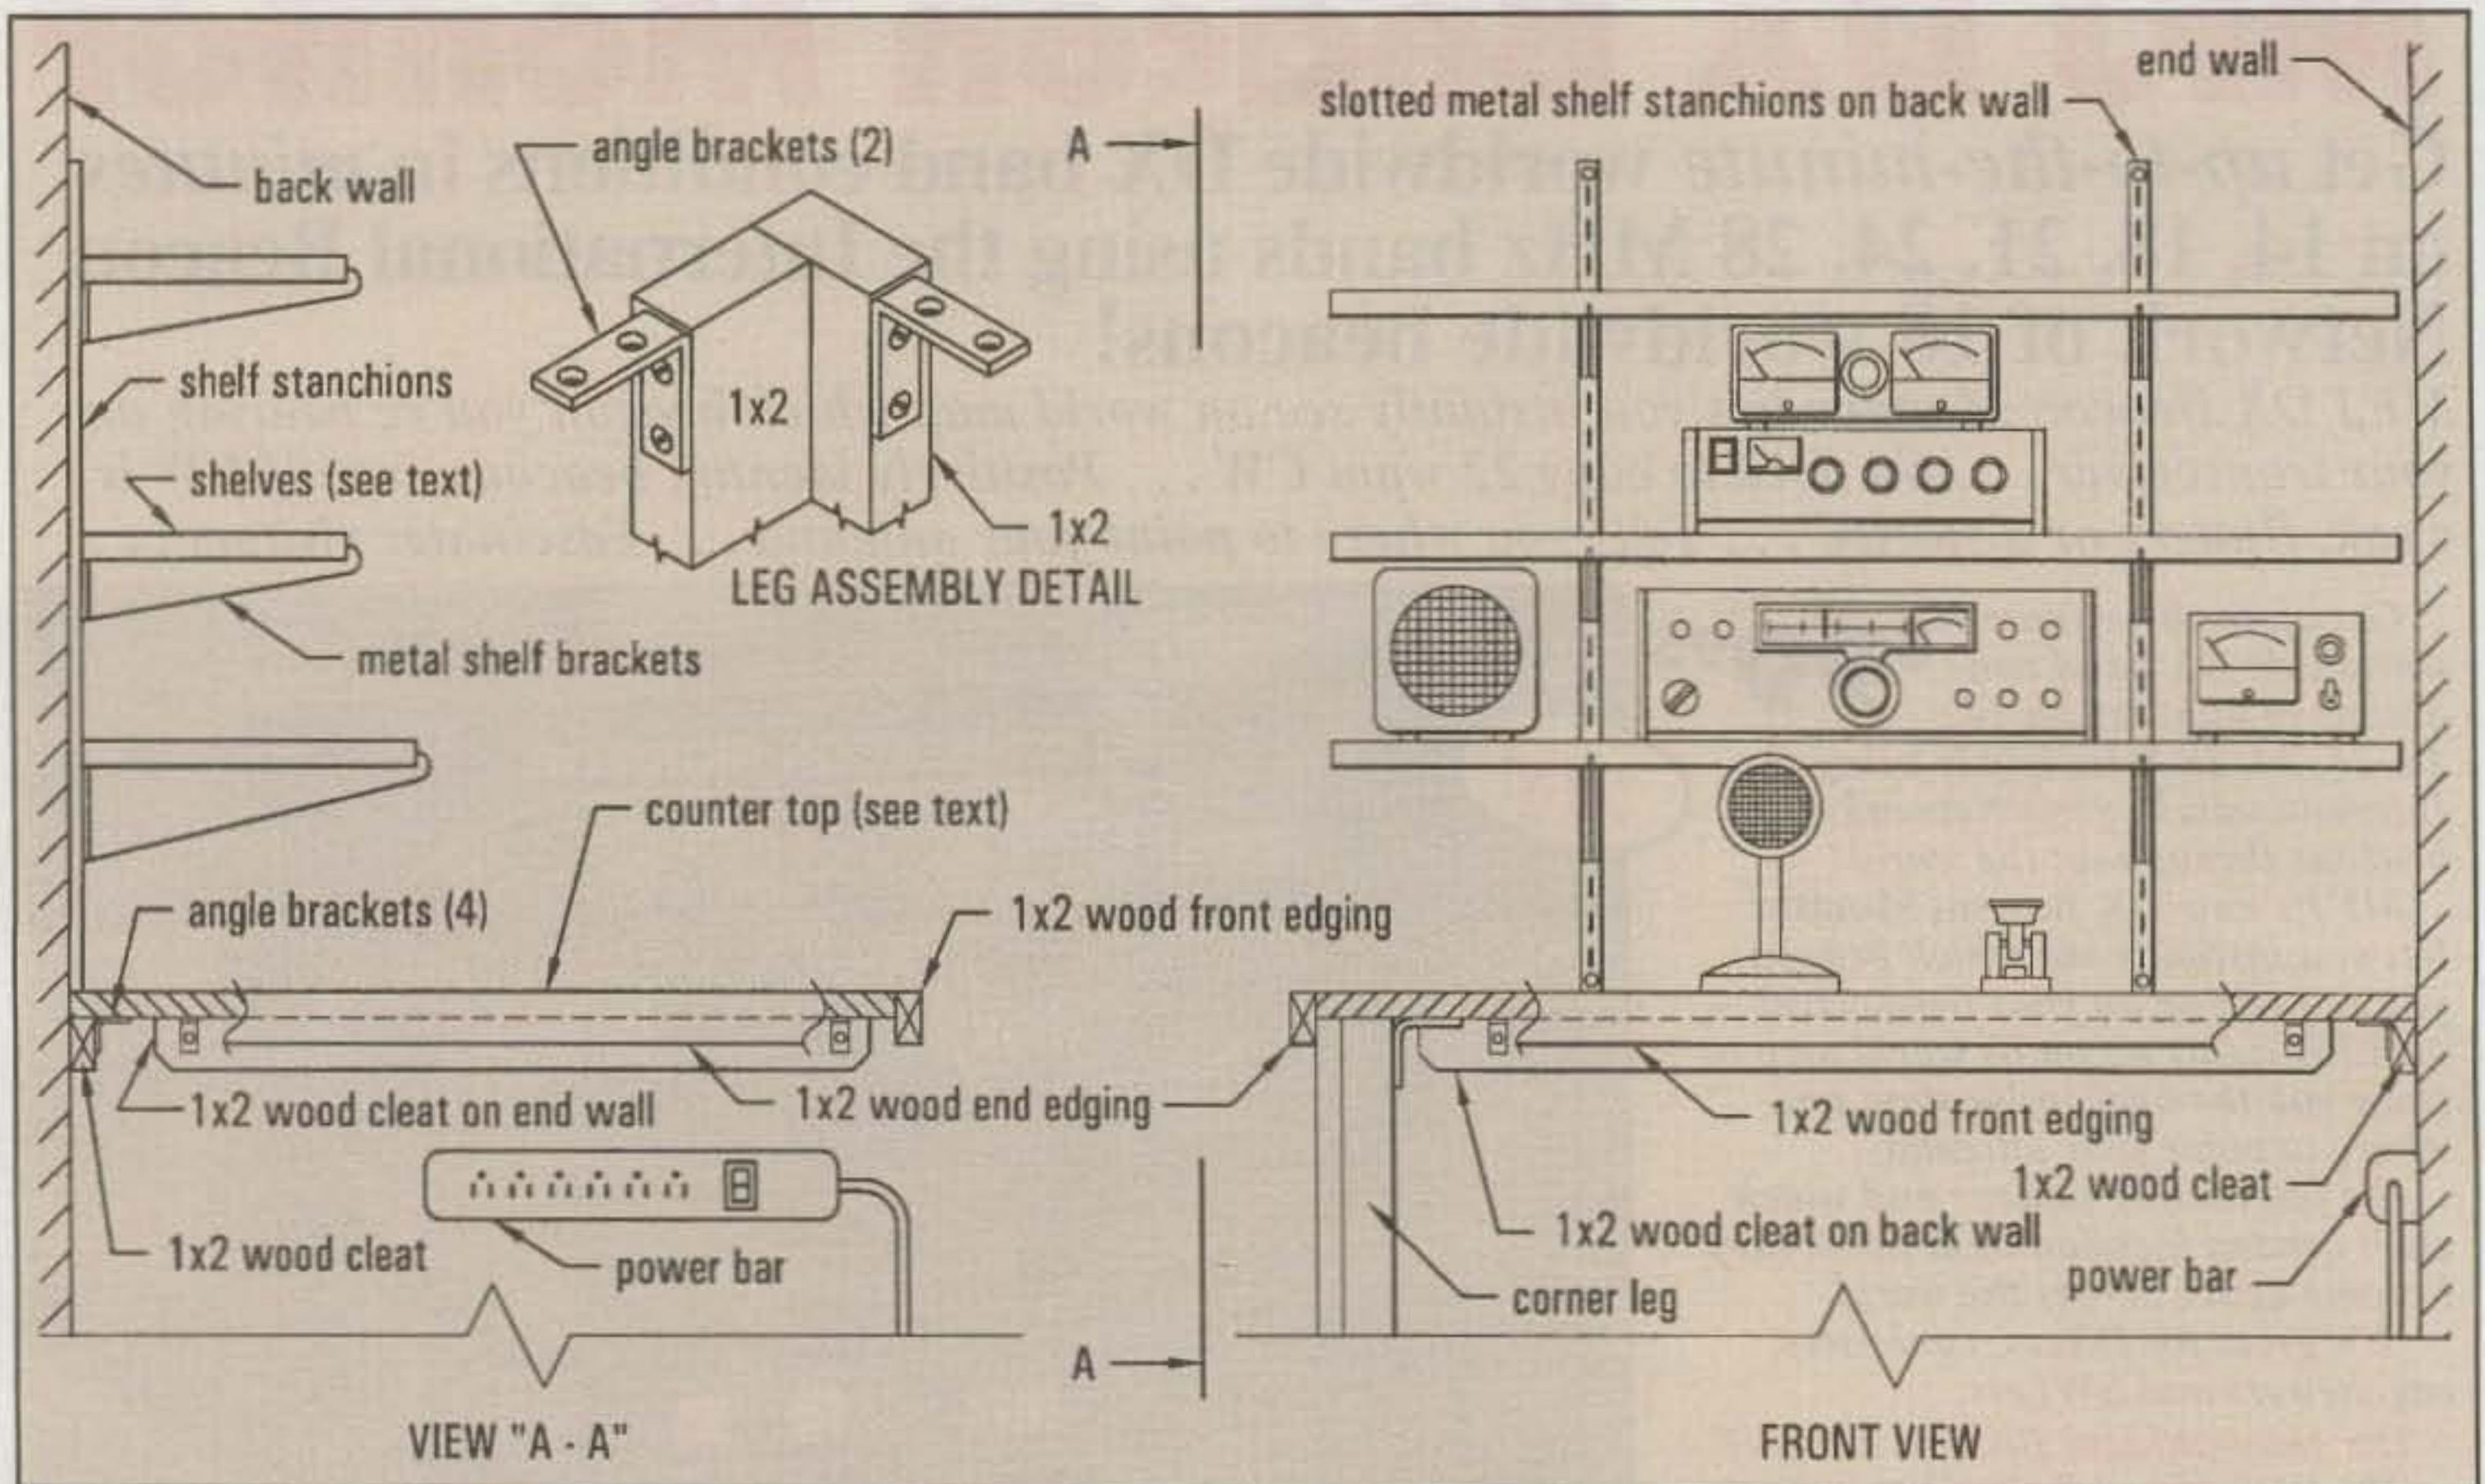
Construction and installation details for the VE3ERP "ham shack in a closet."
